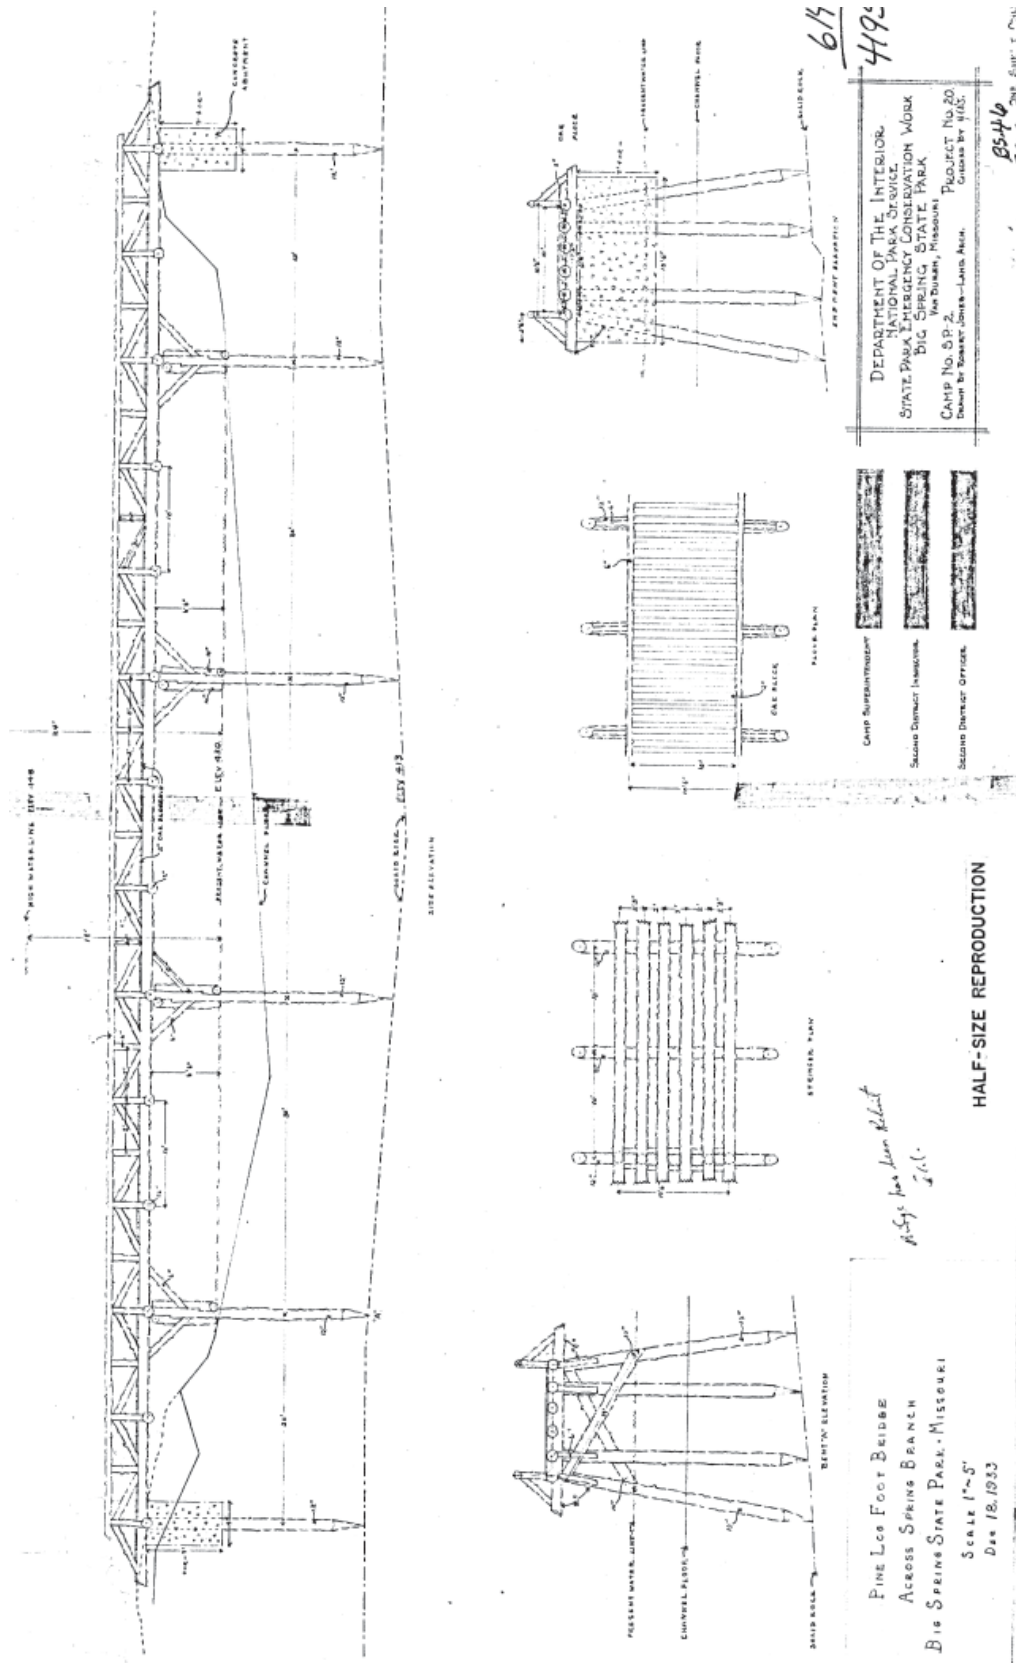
Landscape Architect Robert Jones designed a new pine log bridge for Big Spring branch, 1933. (OZAR Archives)
